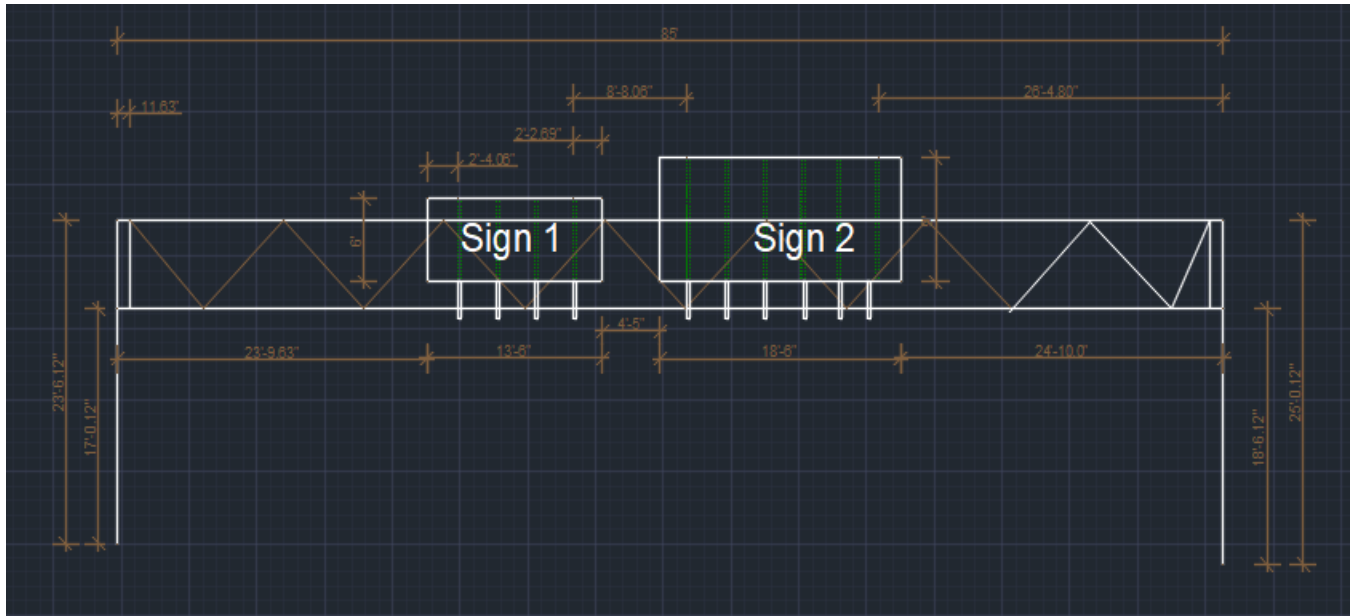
AutoCAD drawing of model 2 structure and its dimensions.
